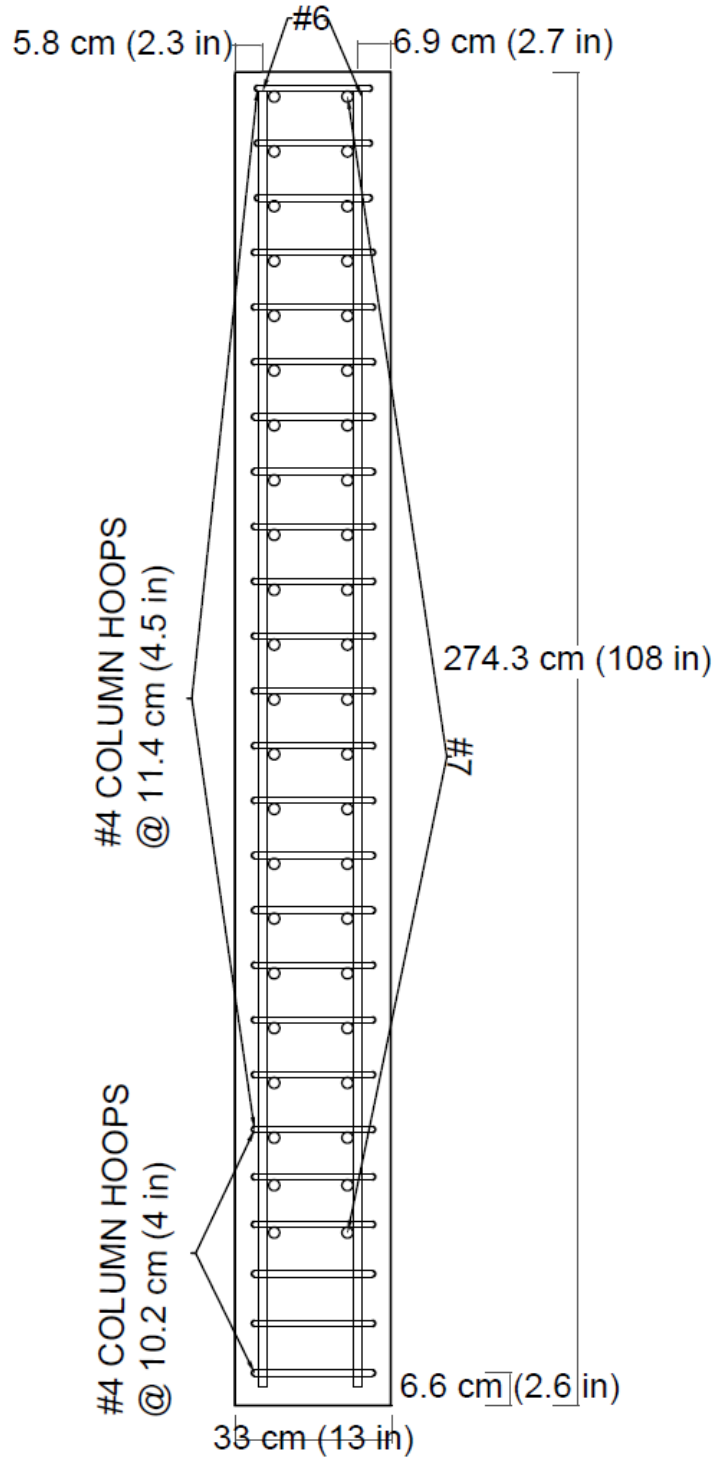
Specimen 1- Reinforcing Steel Layout Plan View B-B
